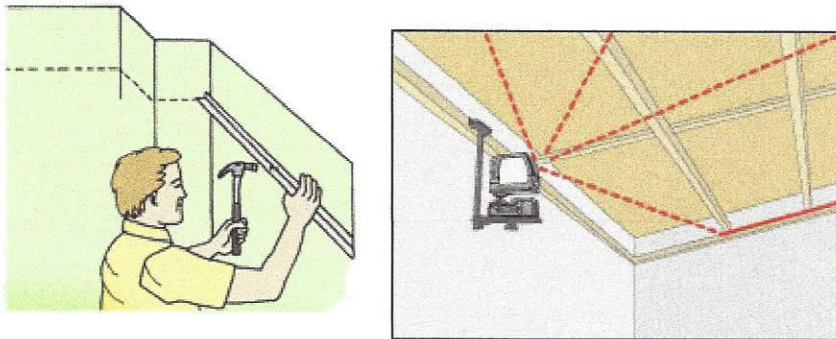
Use a level to apply the wall angle at a proper height around the room.
